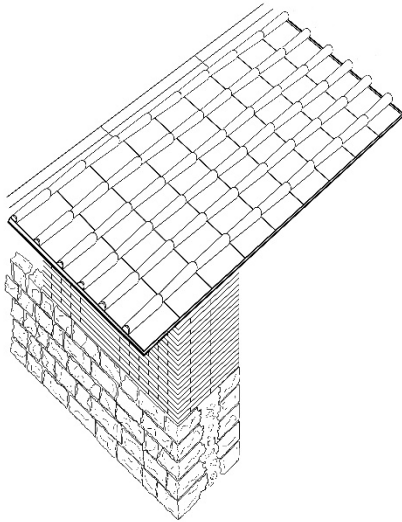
A Schematic Drawing of a Wall and Roof Figure 4. The Eastern Wall of İYA-5 (25 rows of adobe bricks were unearthed).
